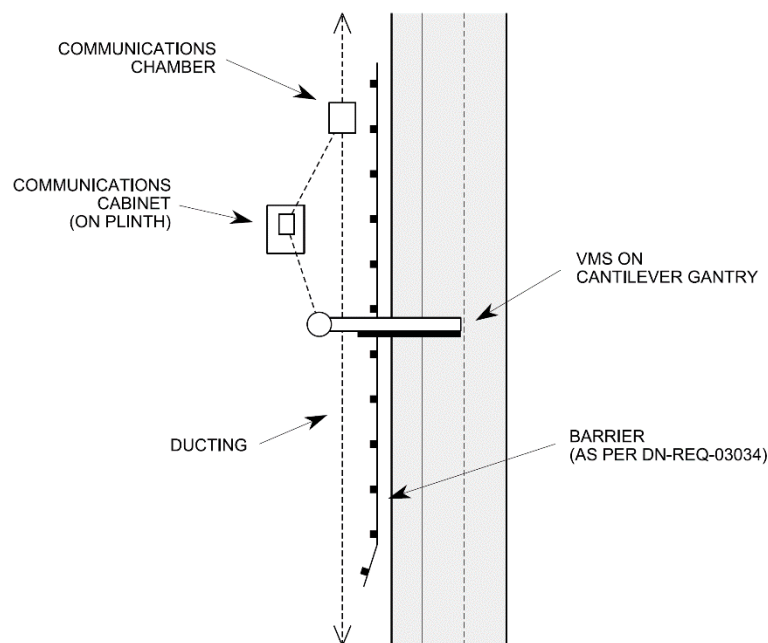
Plan View of Typical VMS Site (VMS on Cantilever Gantry Shown)
